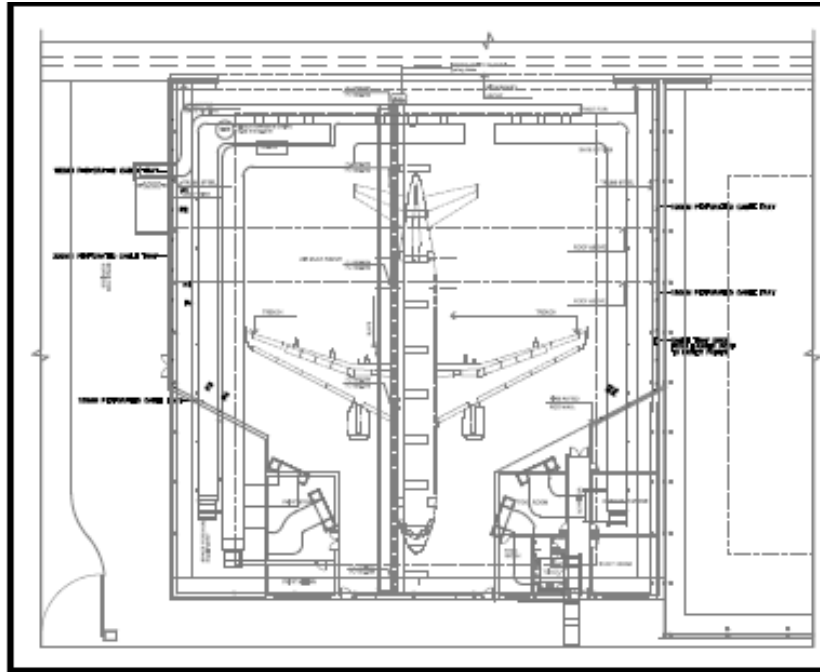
Typical Plan Layout of Airport Hanger Area
